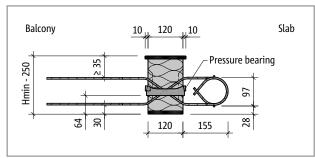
Schöck Isokorb® XT type Q-VV1 to Q-VV4: Product section
